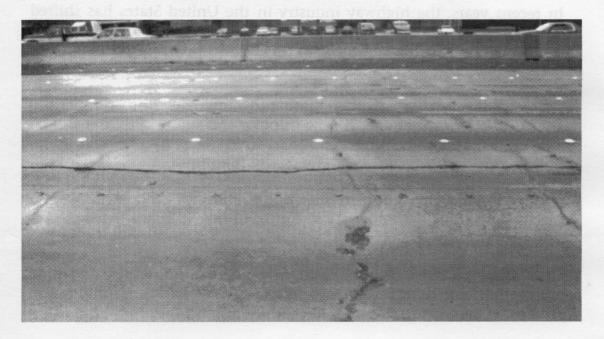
Loop 610 before overlay. Note longitudinal cracking and surface spalling.
